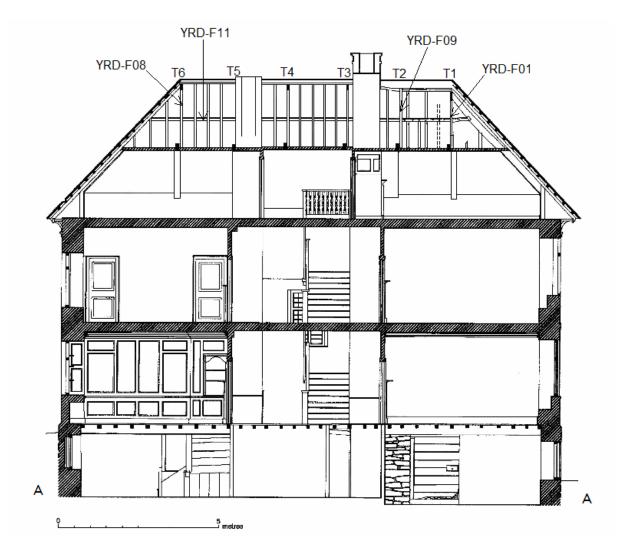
South range; north side A–A, showing the location of samples YRD-F01, YRD-F08–09, and YRD-F11 (John Allan; section position marked on Fig 8)
